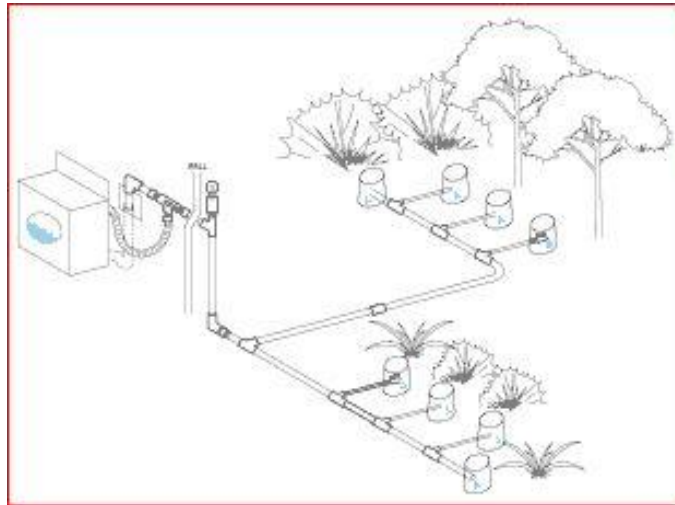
Laundry – to – Landscape system (Allen, 2018).
